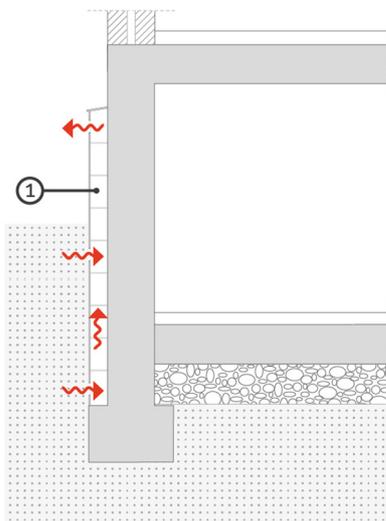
Ventilated cavity added outside an existing basement wall. (1) Prefabricated pieces, [13].
